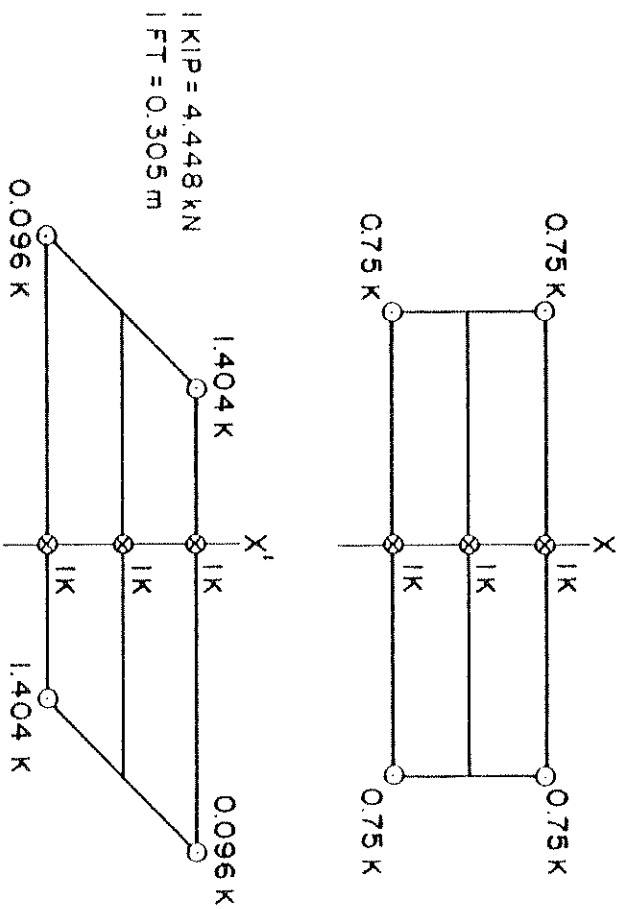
SUPPORT REACTIONS FOR STRAIGHT AND SKEW BOX GIRDERS
